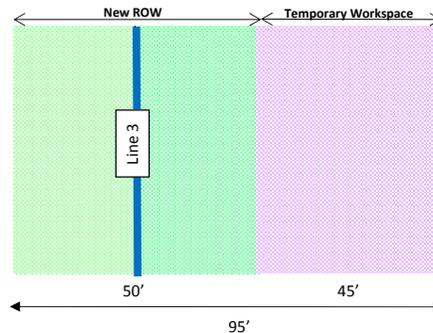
East of Clearbrook Line 3 Construction Workspace (Assumes Sandpiper is Constructed First)
